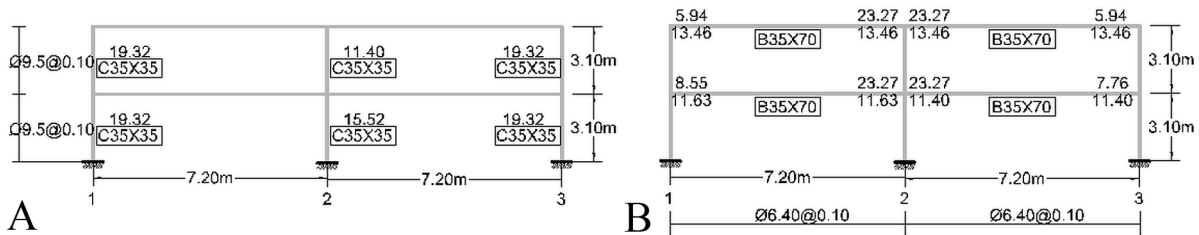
Educational facility, geometry and reinforcement of the Frame C (5-7)= Frame D (5-7) a) columns b) beams
